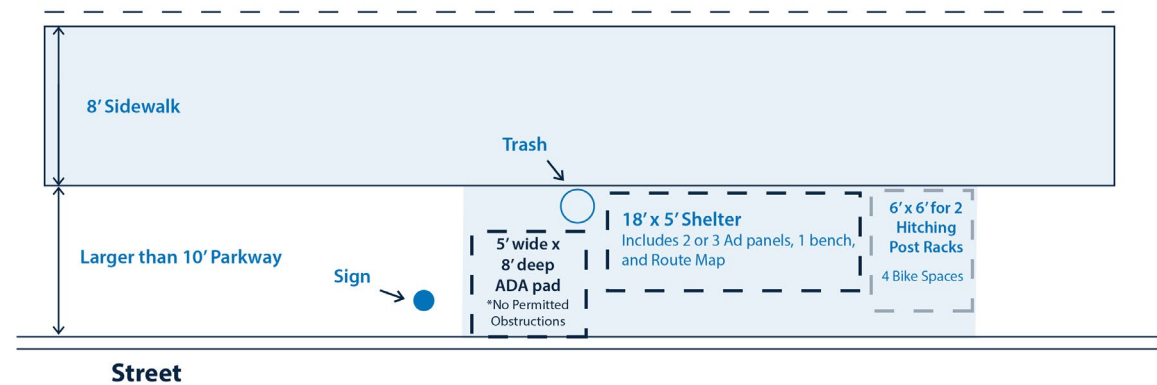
Type III Wide Parkway (Detached Sidewalk) - Amenity Detail
